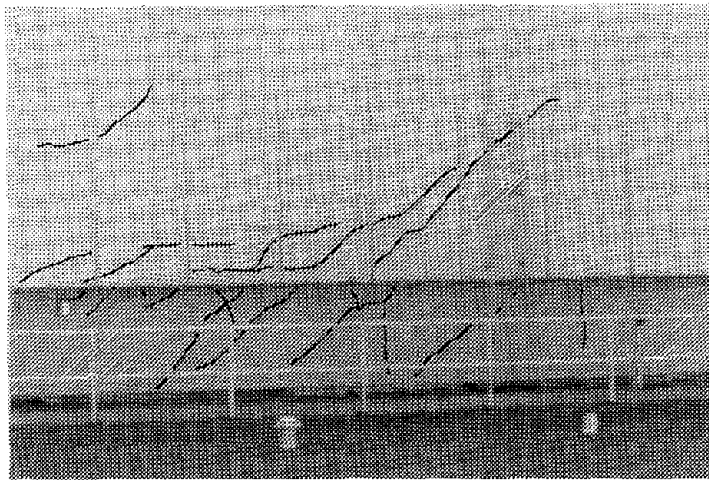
CRACKING PATTERN IN NORTHWALL OF PENTHOUSE D BETWEEN COLUMN L-22 AND L-19
